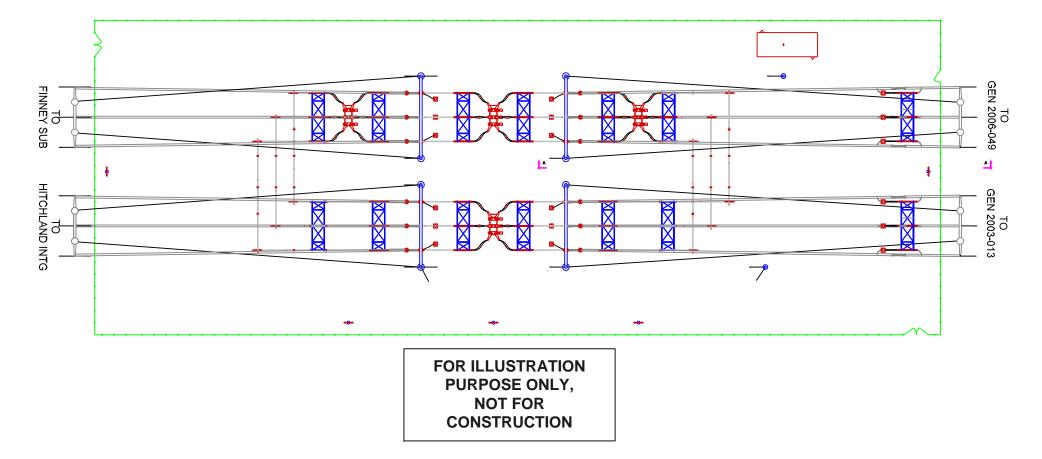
New Switching Station Interconnection Facility Preliminary Plan View
